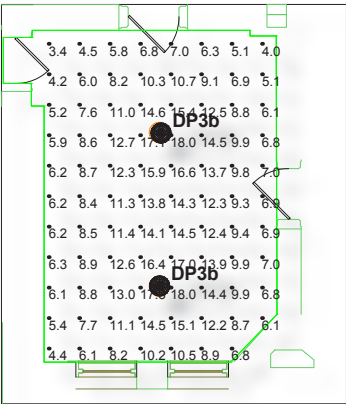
Lighting Calculation: First Floor SE Private Office
